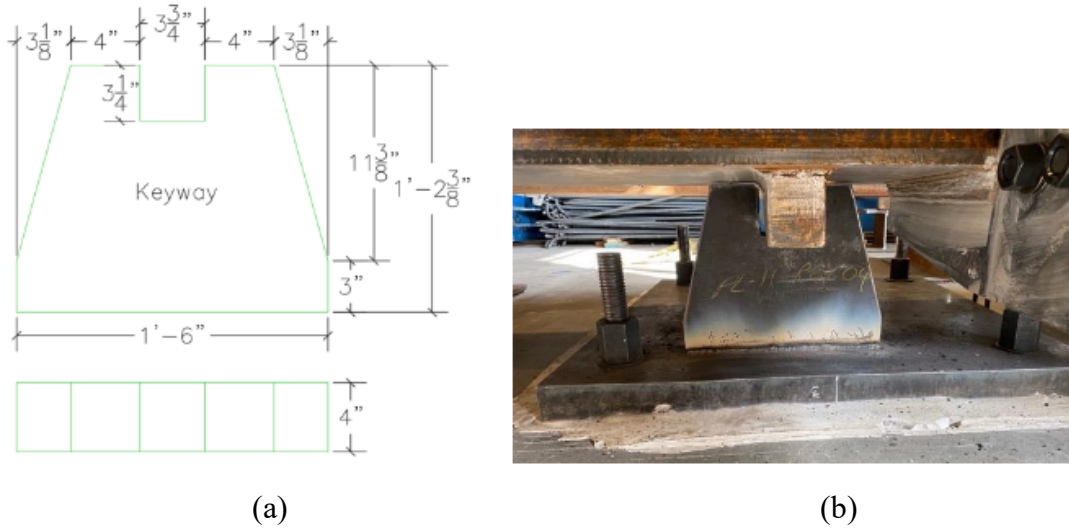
Keyway Plate Dimensions (a) and Keyway Plate Welded in Place (b)
